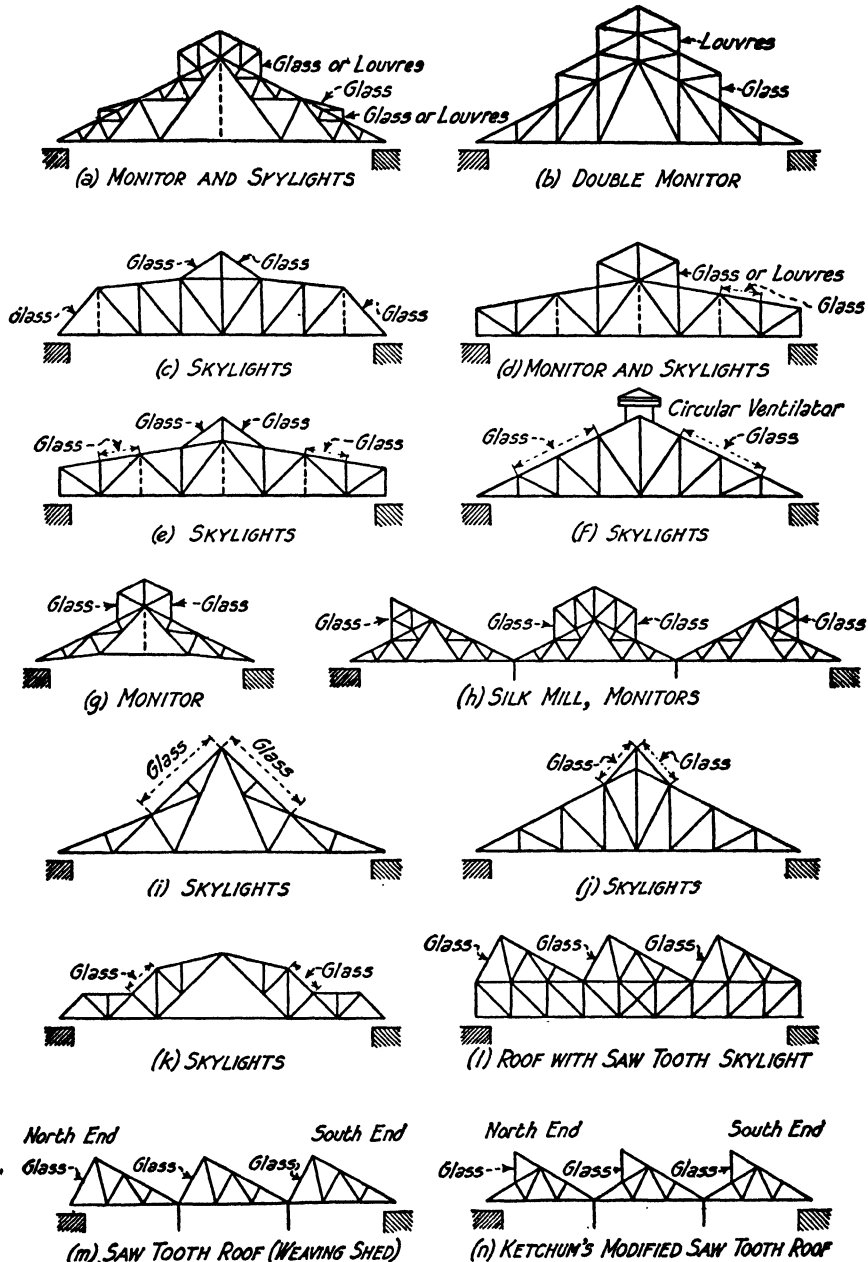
ROOF TRUSSES SHOWING METHODS OF LIGHTING AND VENTILATING.
